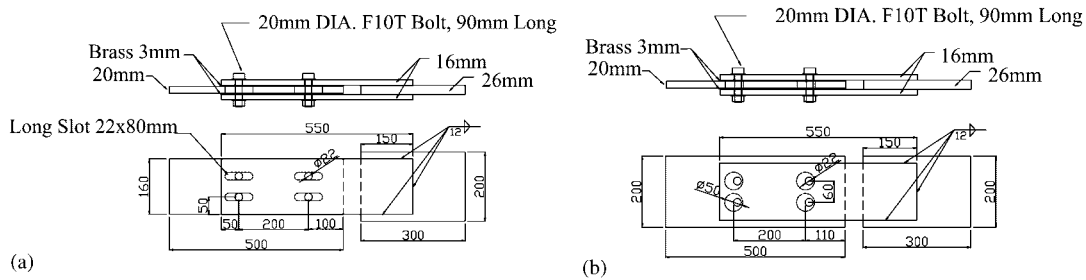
Details of bolted friction device specimens: (a) Specimens SF and SB and (b) Specimens CF and CB.
